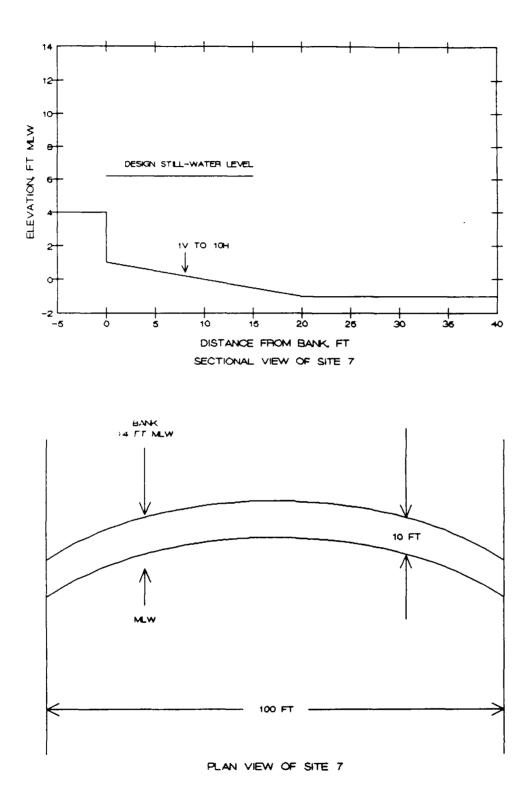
SECTIONAL AND PLAN VIEWS OF SITE 7
